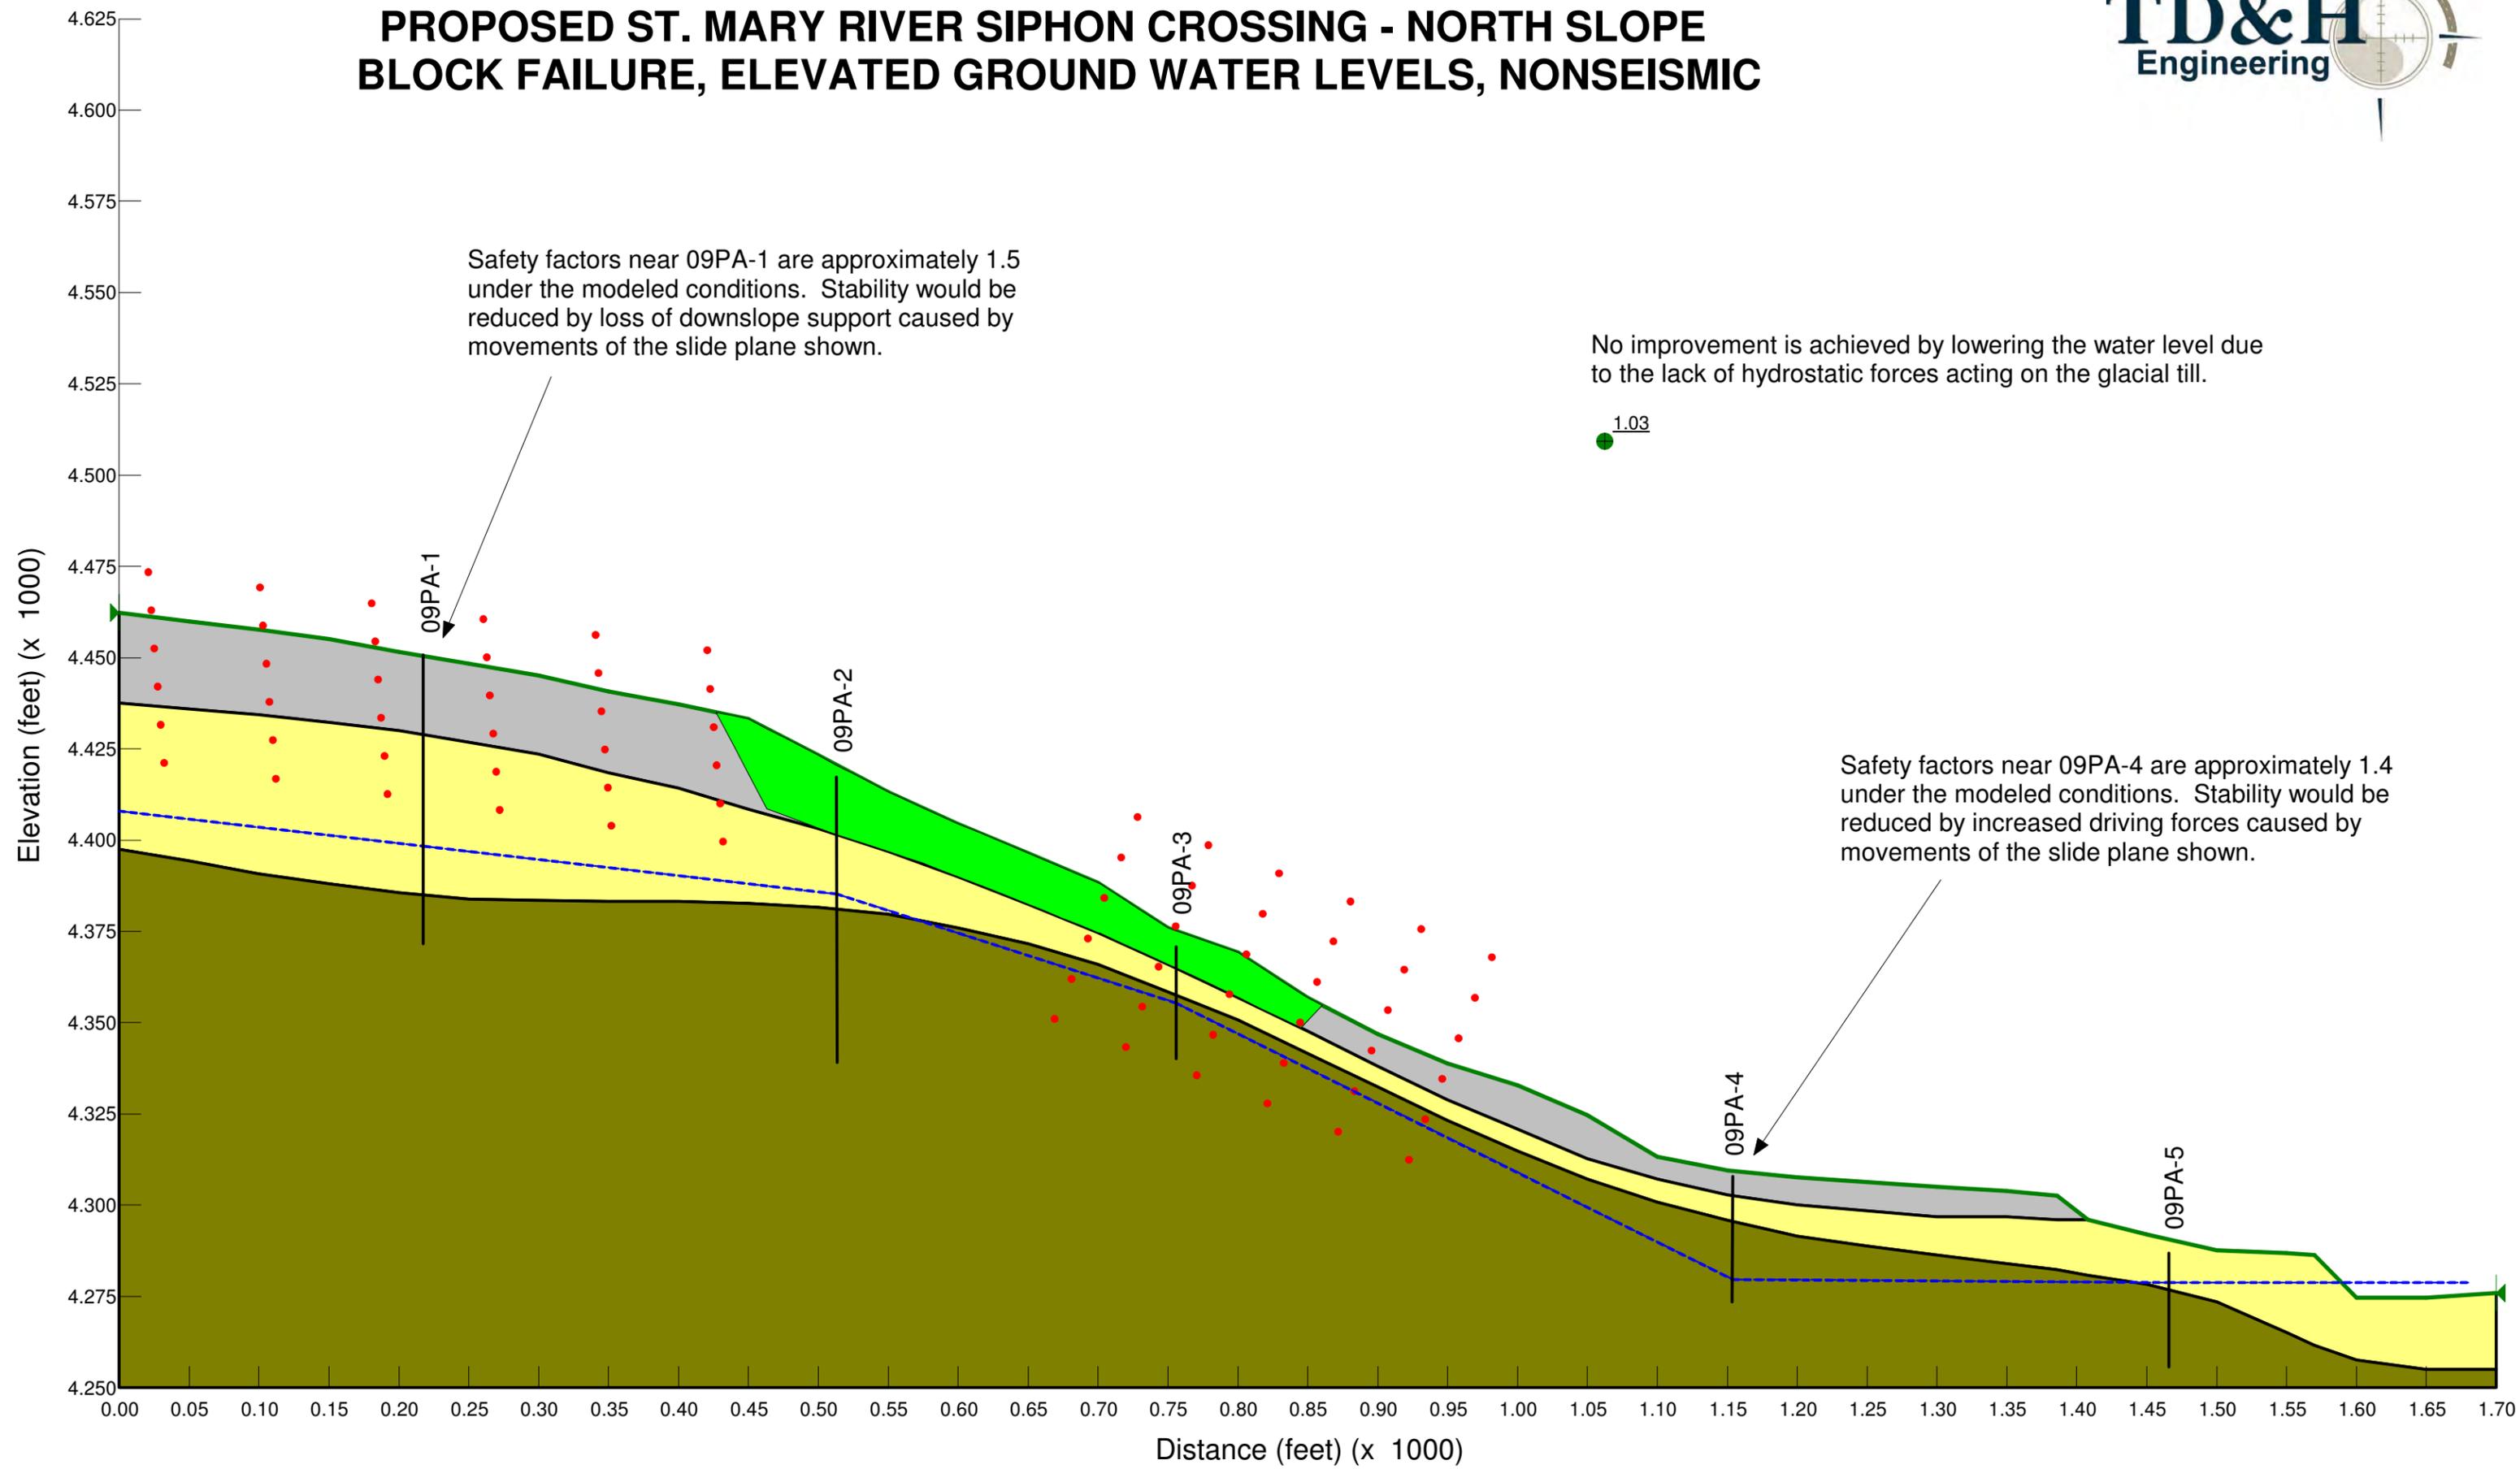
PROPOSED ST. MARY RIVER SIPHON CROSSING - NORTH SLOPE BLOCK FAILURE, ELEVATED GROUND WATER LEVELS, NONSEISMIC
